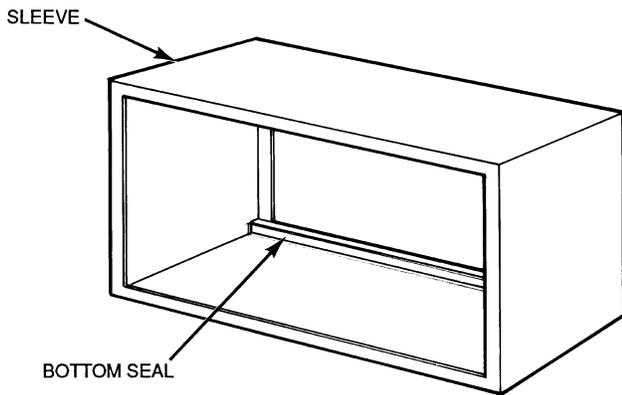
Remove Bottom Seal from GE Plastic Sleeve
